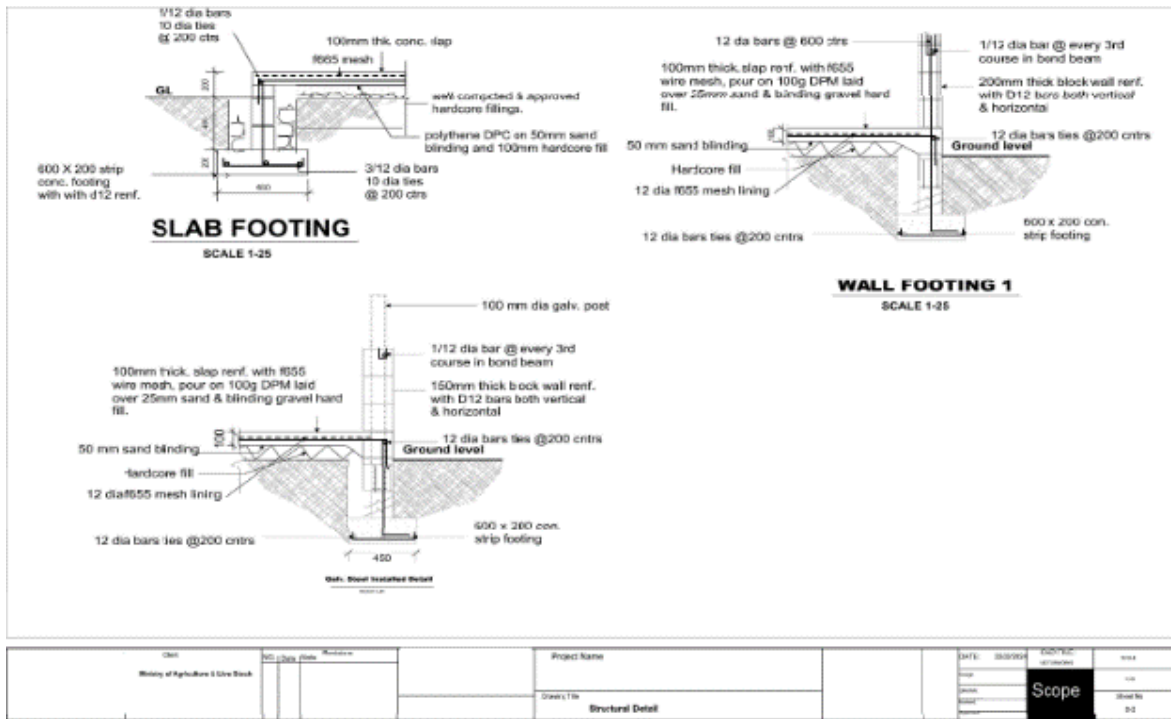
Drawing of the reinforced and block wall footing foundation.
